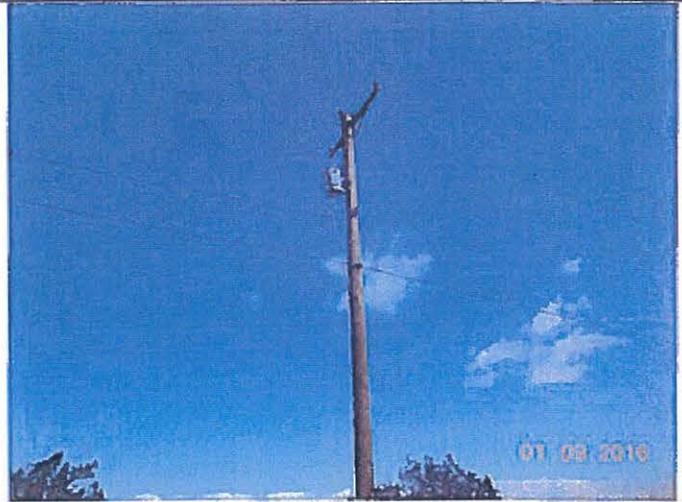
PNM pole-mount transformer (Station No. 1884) located near the northeast corner of the site
